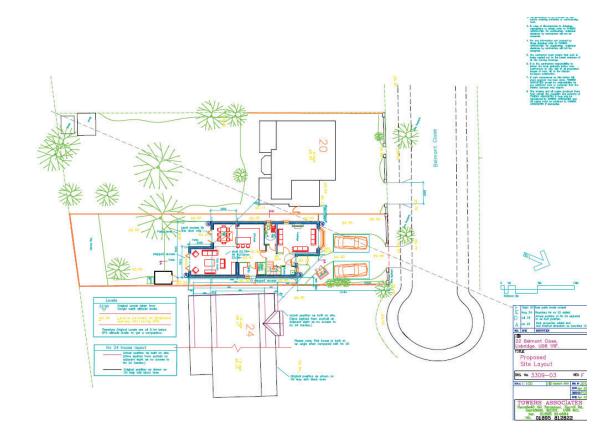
Proposed Plan (please note – larger version of plan can be found in the Committee Plan Pack)
